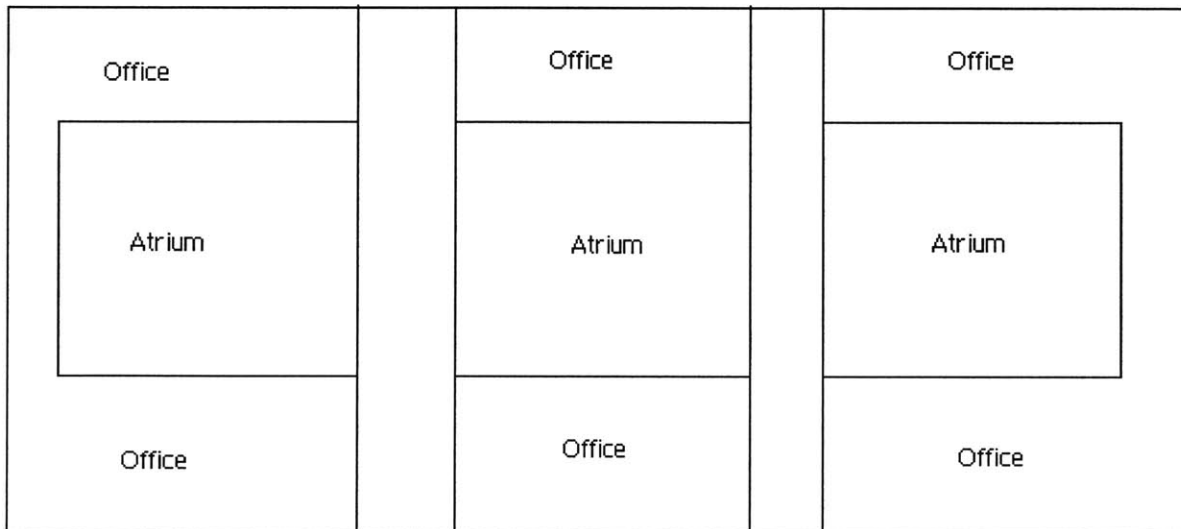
Approximate schematic of the building’s floor plan. Each of the three atriums is surrounded on the North and South by open plan offices.
